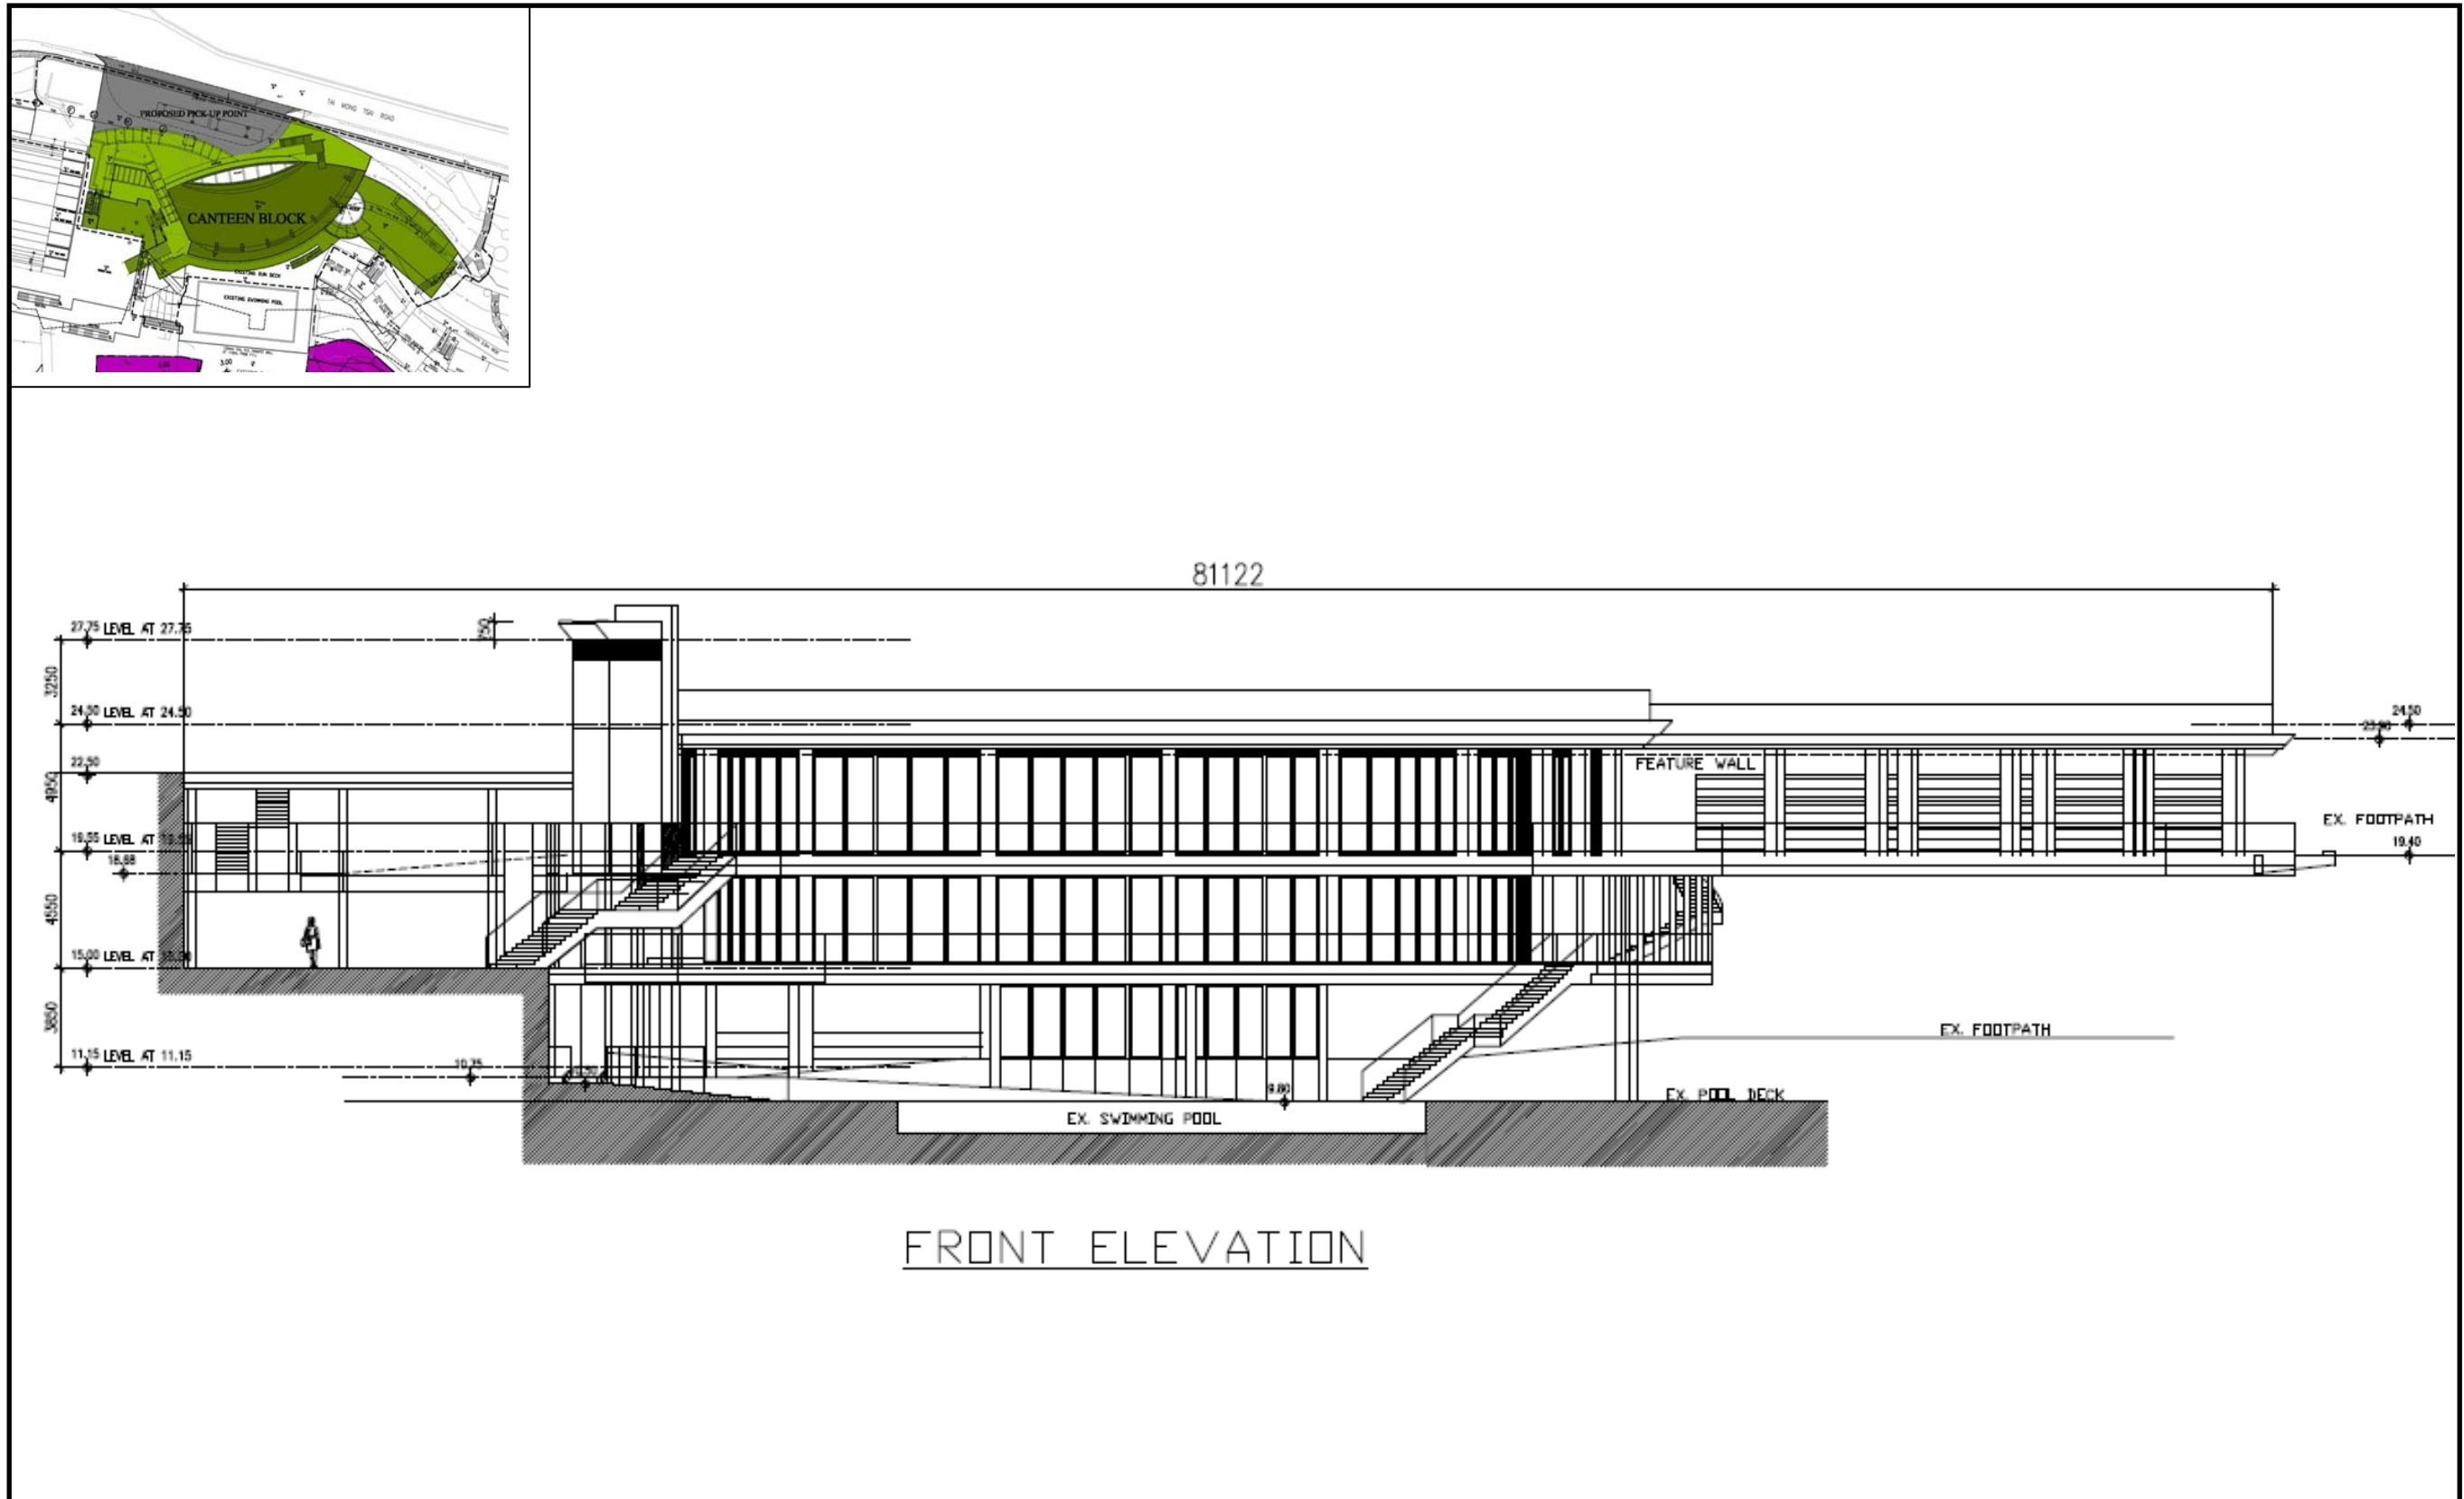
Front View of Proposed Canteen Block showing the Elevations (in m) and Dimension (in mm) and its Relation to Tai Mong Tsai Road
